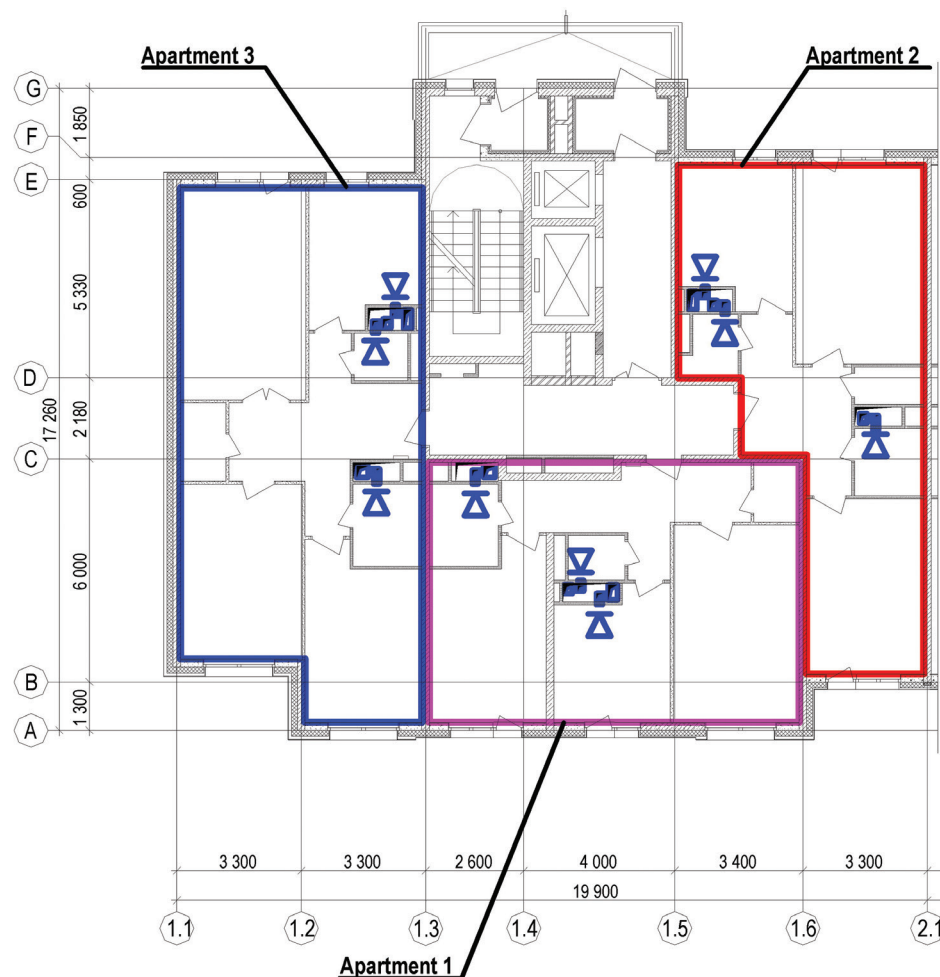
Fragment of the plan of a typical floor in a multi-storey residential building
